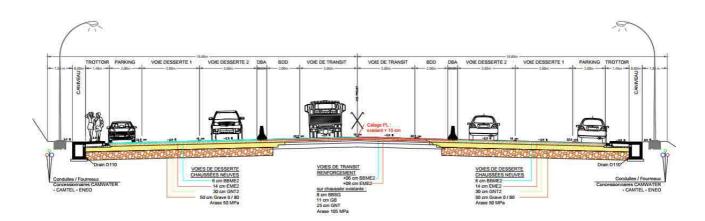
TYPICAL CROSS SECTIONS OF THE ROADWAY LAYOUT
